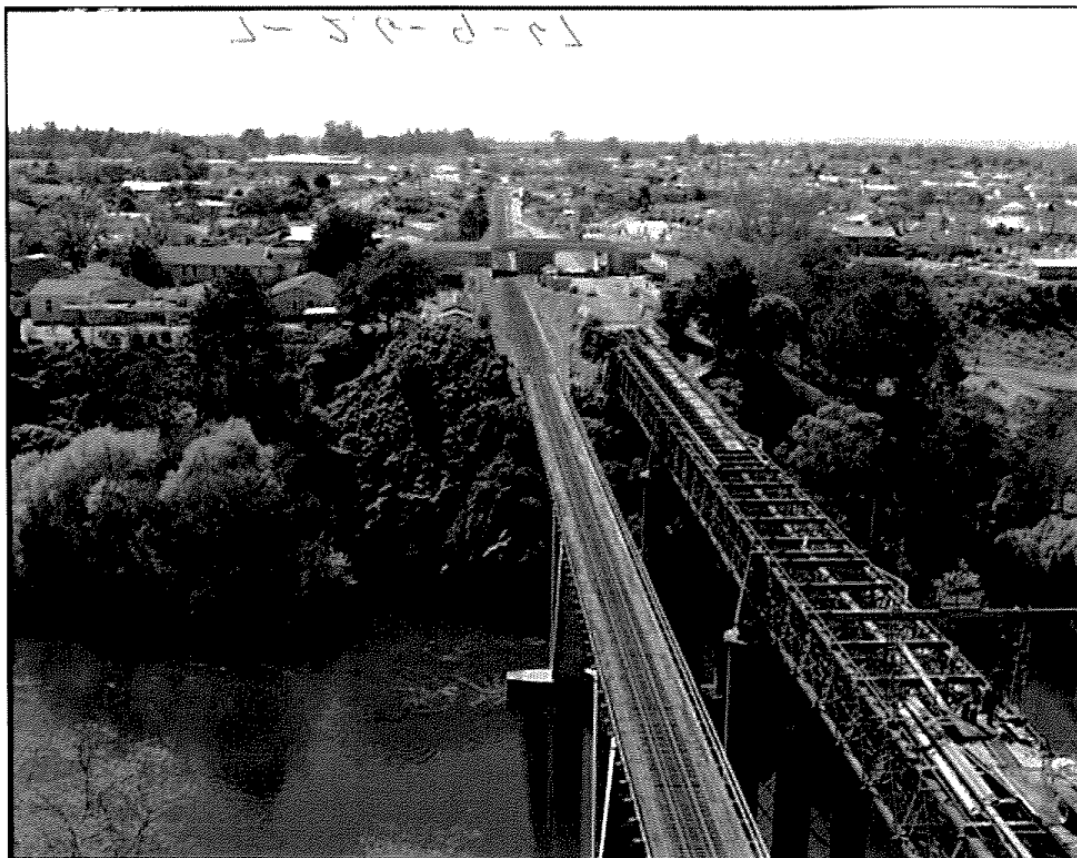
CONVERSION OF THE FORMER HAMILTON RAILWAY BRIDGE TO A TRAFFIC BRIDGE IN 1964.
